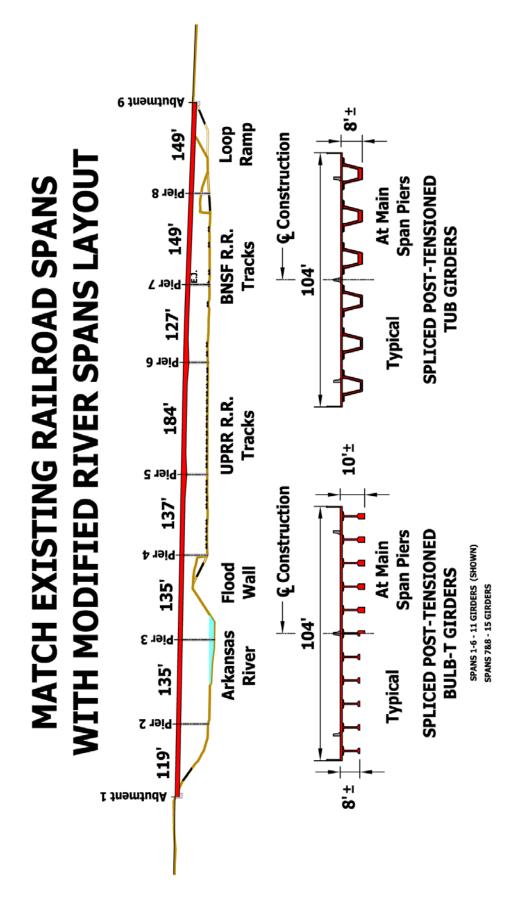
Match Existing RR Spans w/ Modified River Spans - Elevation
